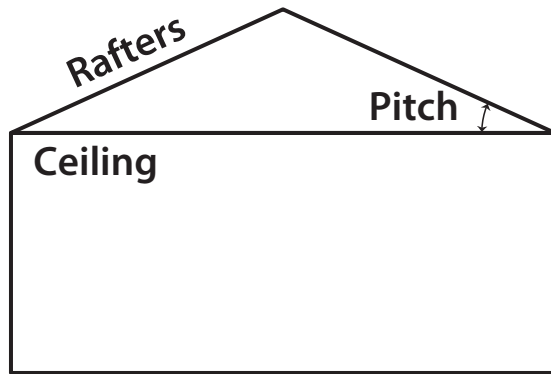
Schematic section through poultry house showing the pitch of the roof, the location of the rafters and the position of the ceiling.
